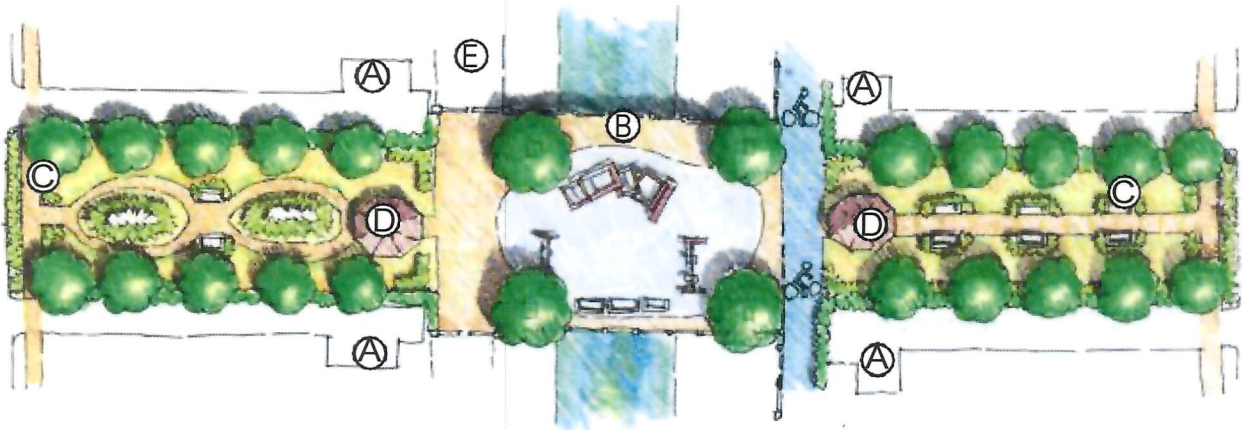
Pocket Park Concept at the East End of 220th Street
